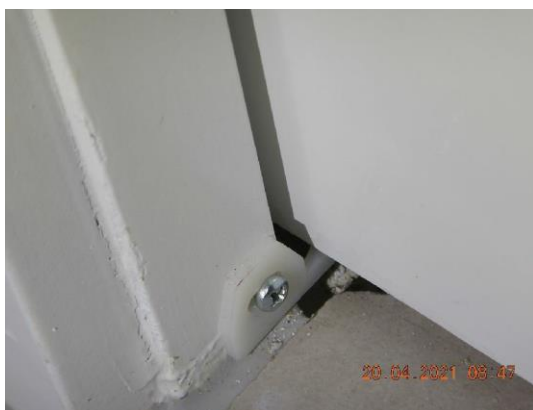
TYPICAL BATHROOM DOOR DETAIL FOR WHOLE BATHROOM WATERPROOFING
